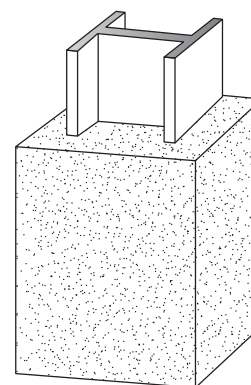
Steel column with concrete encasement.<sup>24</sup>
